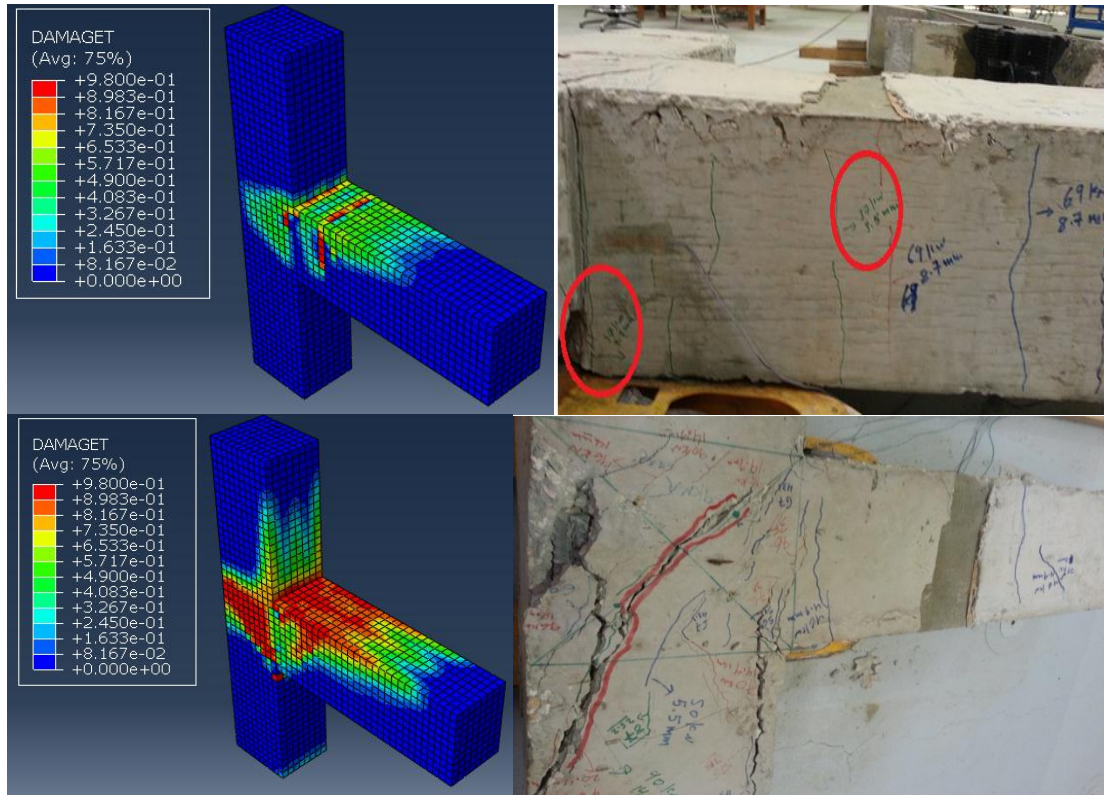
Damage propagation and crack pattern for NC-BCJ-18MM specimen
